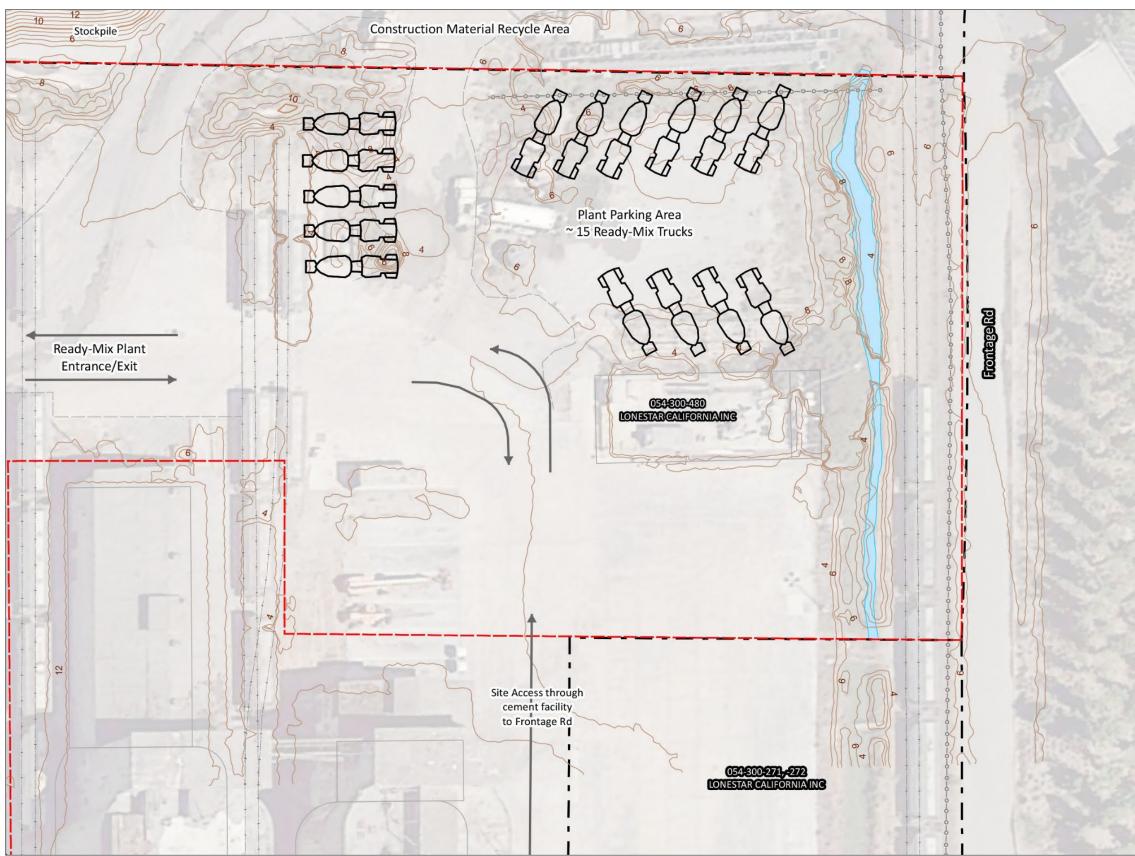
Proposed Site Plan Detail (2 of 2)
